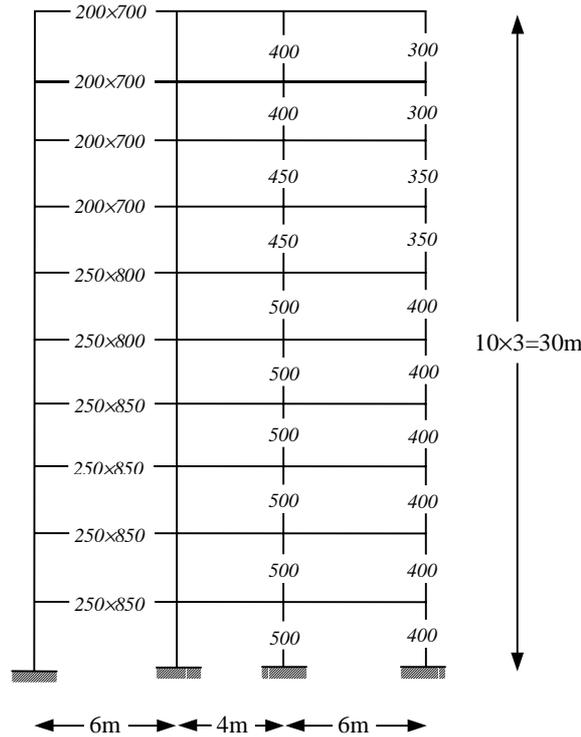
Geometry of bare frame and dimensions of member cross-sections (in mm)
